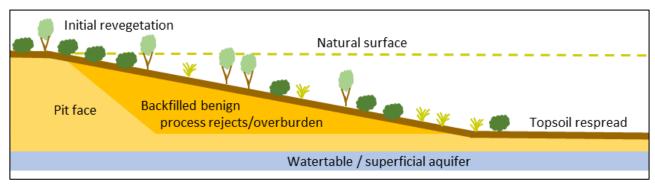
Conceptual Planned Backfill and Rehabilitated Pit Walls
